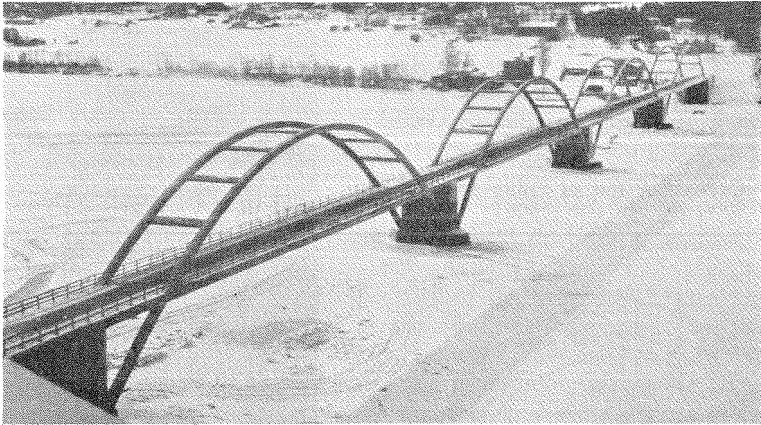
Road Bridge at Hammar, Sweden. Built in 1910.
